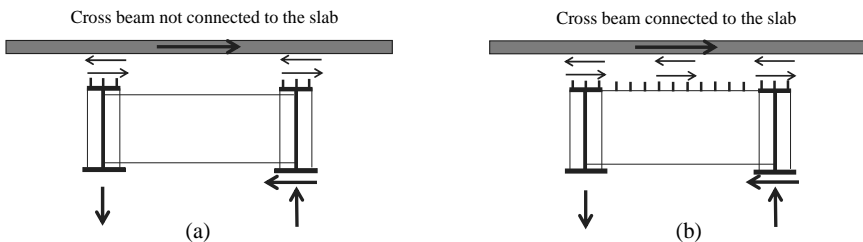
Transfer mechanism of transverse seismic actions for twin I-shaped girders with cross beams (a) not connected to the slab and (b) cross beams connected to the slab.
